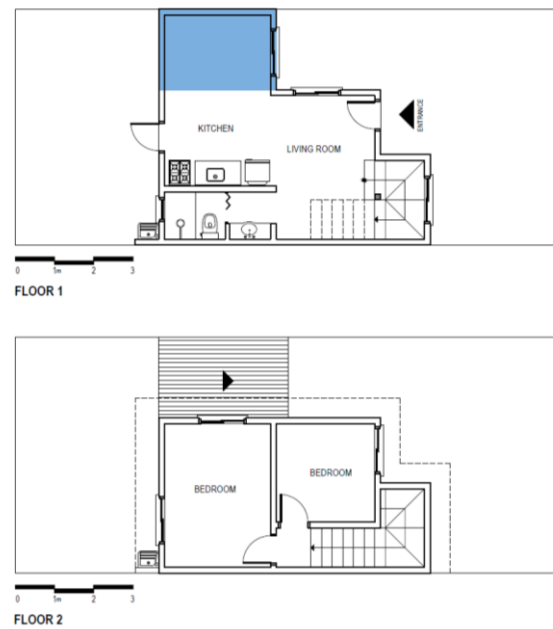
Floor plans inserted on the lot – option 1.
